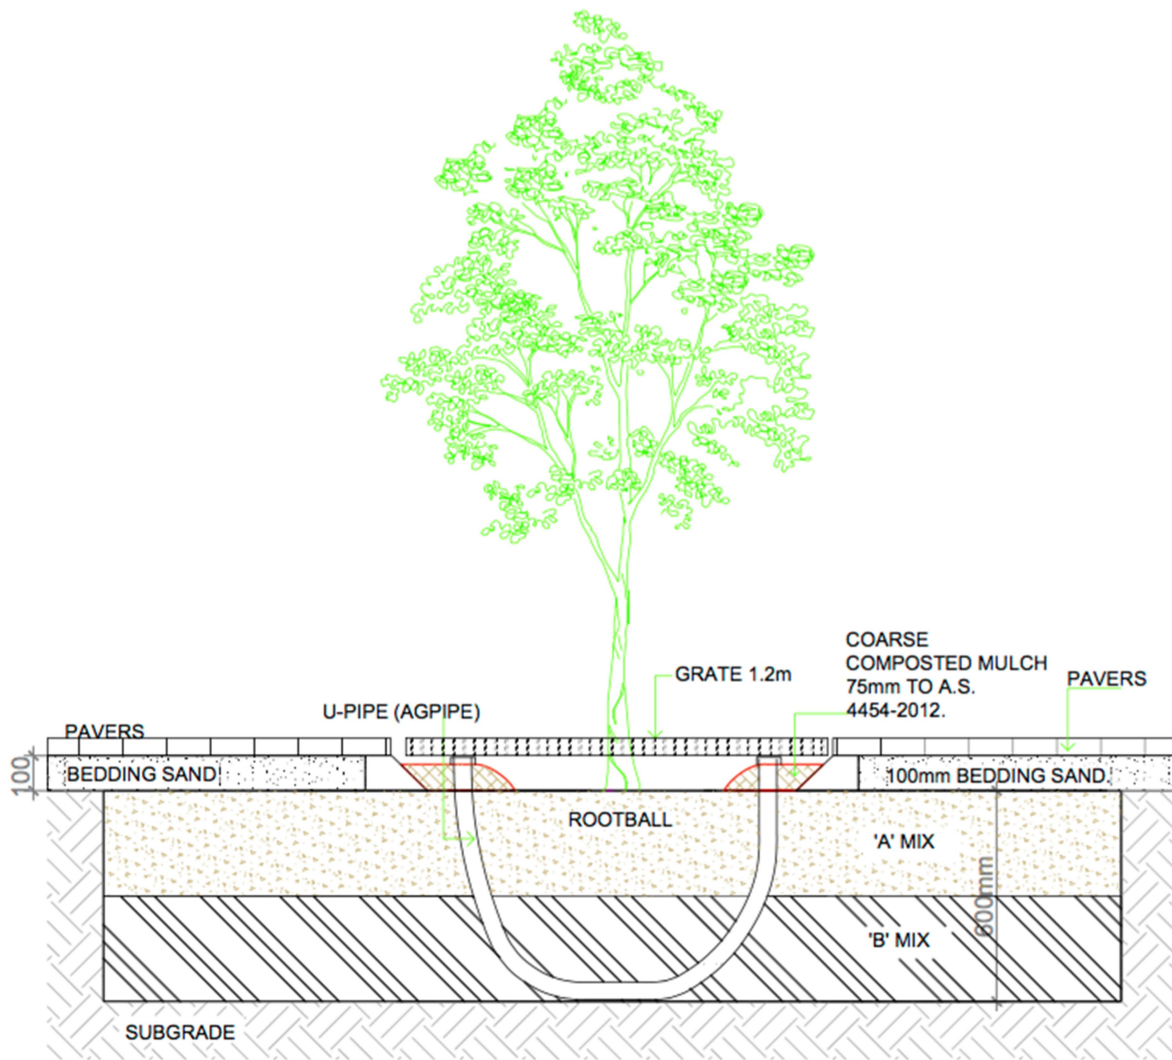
Typical cross section: Restricted space poor drainage option (3 layers). Refer to Council's standard drawings for design details.
